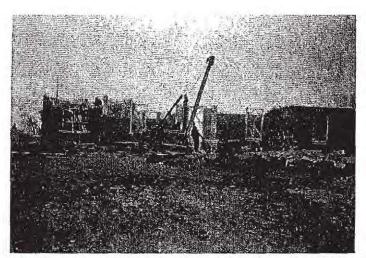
Bell Estate under construction, October 28, 1937. View of north elevation. Ontario Archives.
